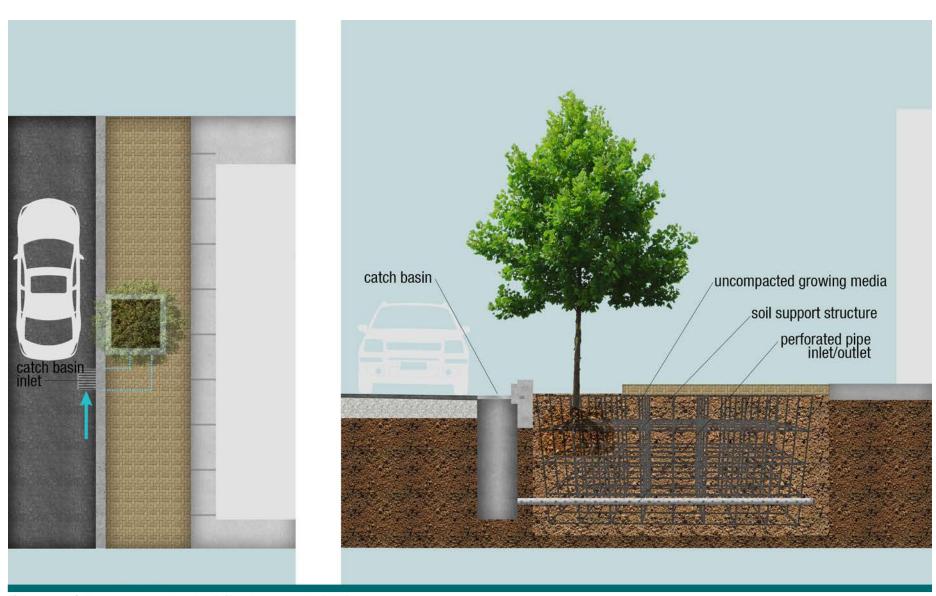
Soil support system plan view [left] and cross-section [right]
